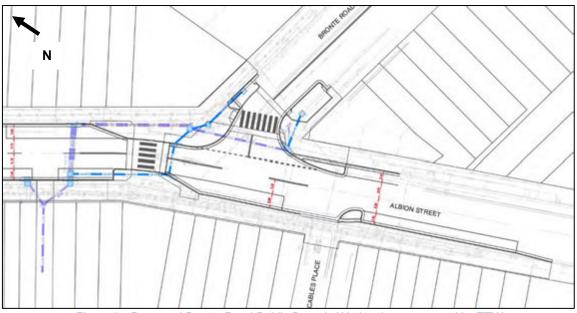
Proposed Bronte Road Public Domain Works plans, prepared by TTW
